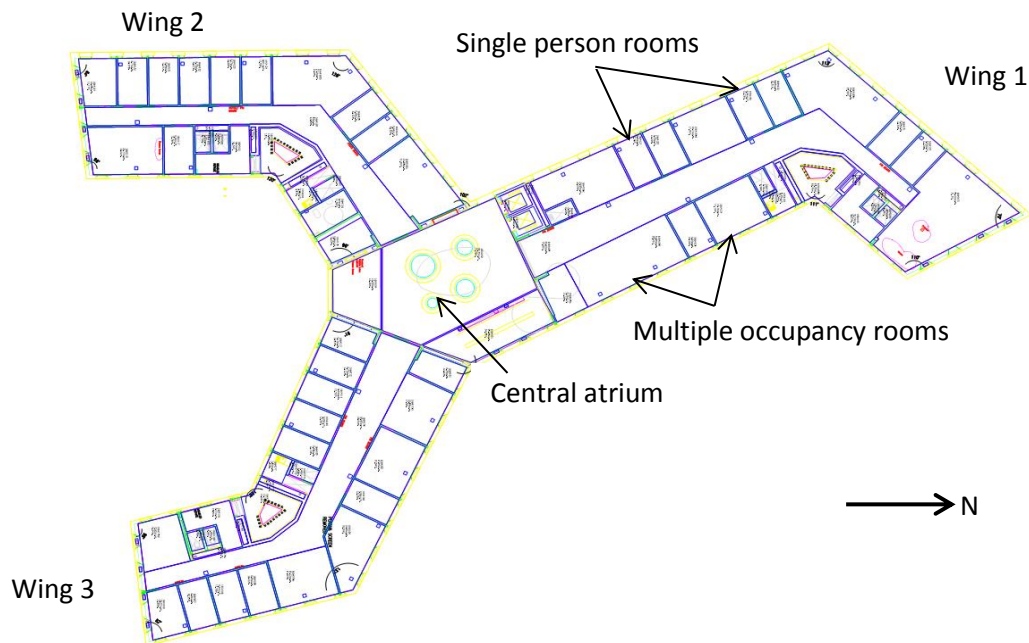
Typical floor plan of Building 1 (University of Sheffield Development & Property Services, 2009)
